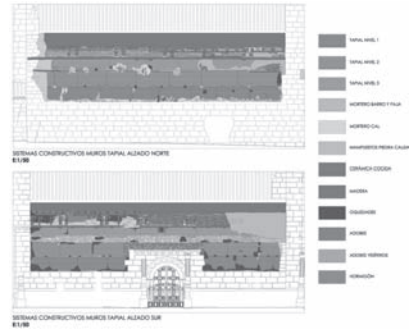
Wall face reading. (Félix Jové, GrupoTIERRA).
